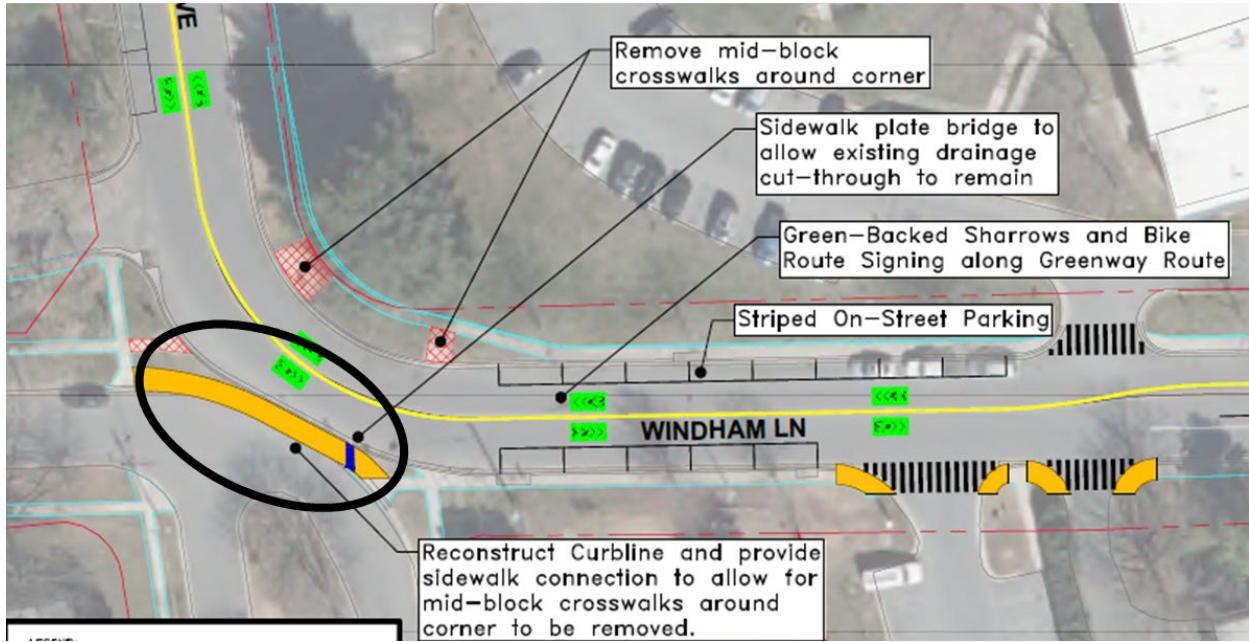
Concept plan drawing showing proposed modification to the Douglas Avenue diagonal diversion.
